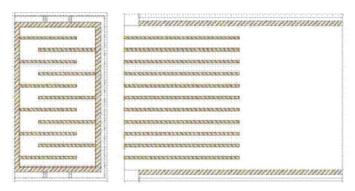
Drawing of the lining and baffle configurations that were installed in two pairs of ventilation shafts in the Liu building.
